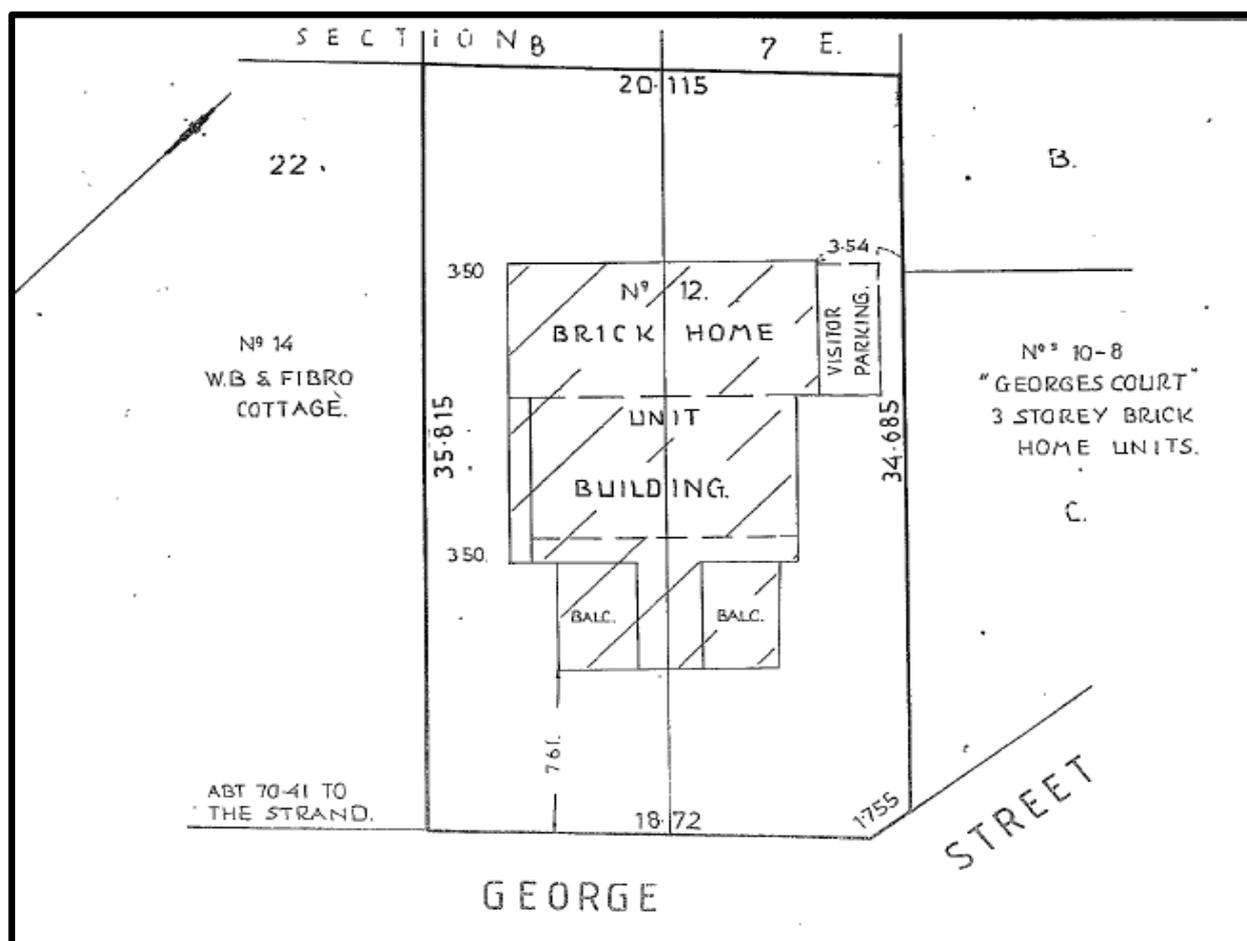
Subdivision Plan for the adjoining RFB at 12 George Street (courtesy: Georges River Council)
